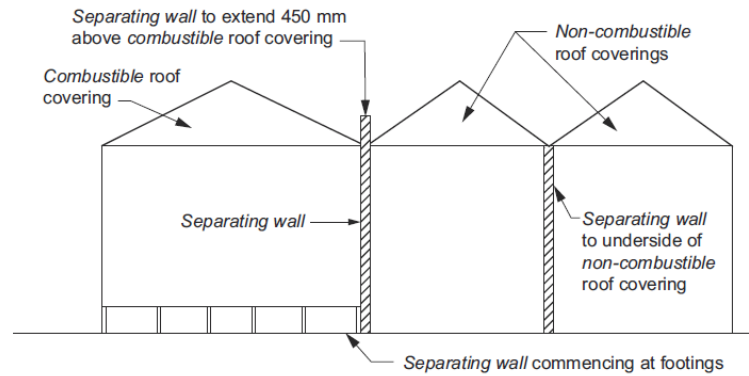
Separating wall construction — Underside of non-combustible roof cladding (diagram 1)
